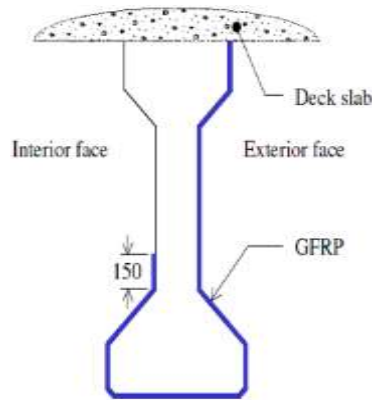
GFRP Jacketed cross-section of prestressed concrete bridge girder (Demers et al. 2006)
